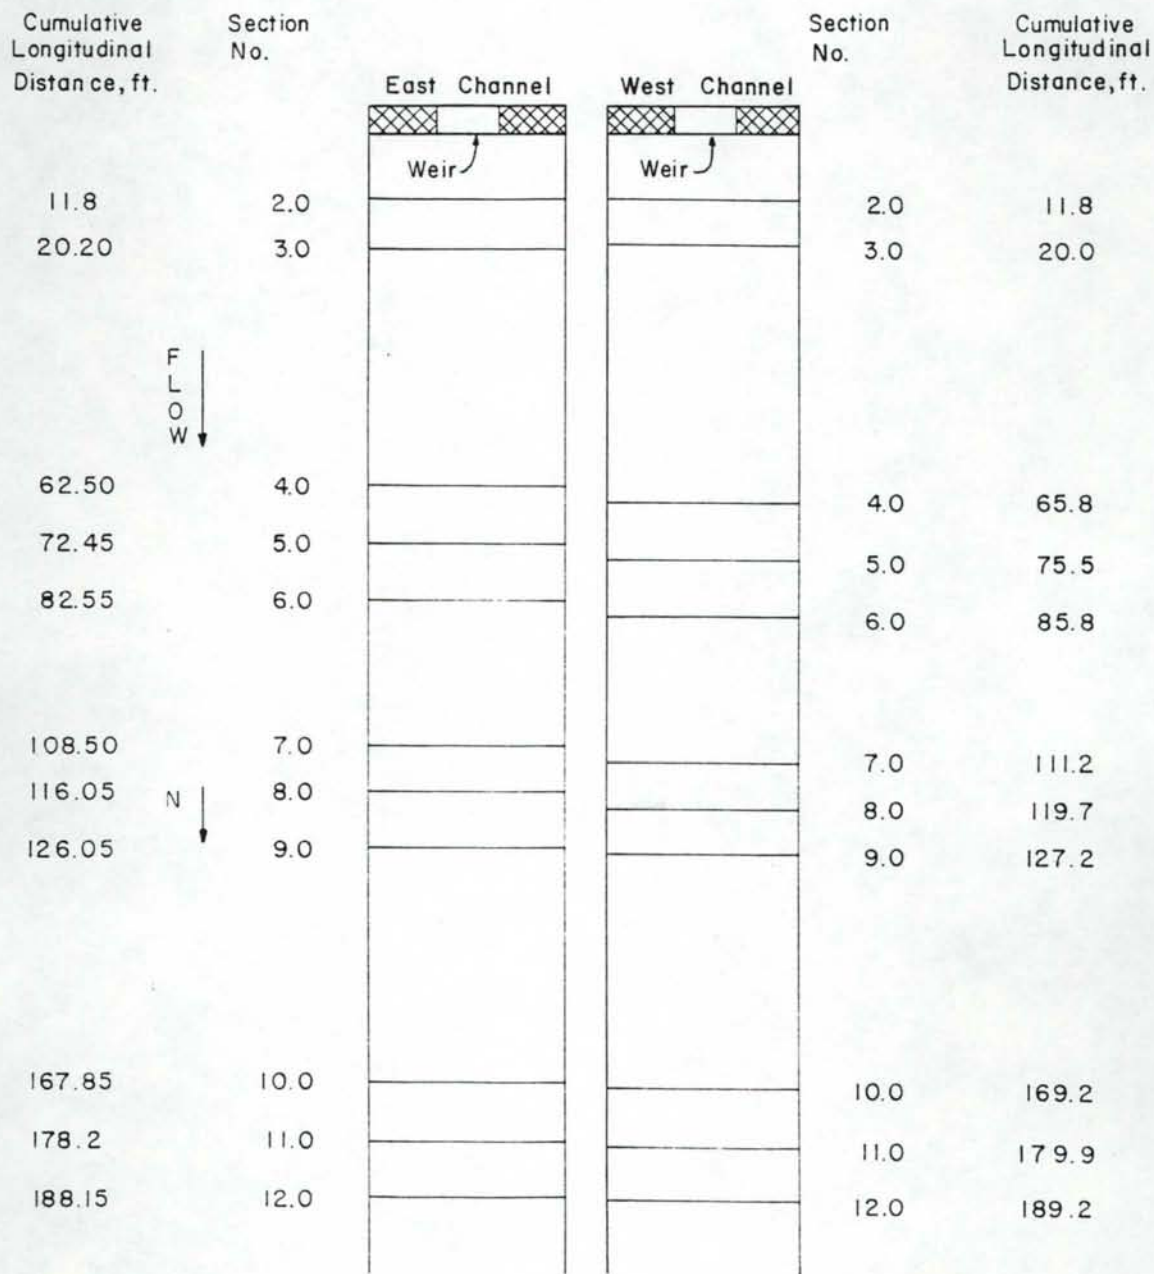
Plan view of the Troy channels cross-section layout for the winter data collection.
